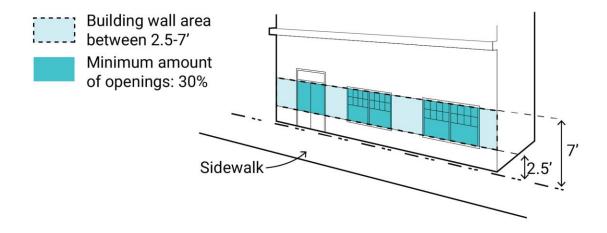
(B)(6)(c): Window opening and transparency, residential common spaces
